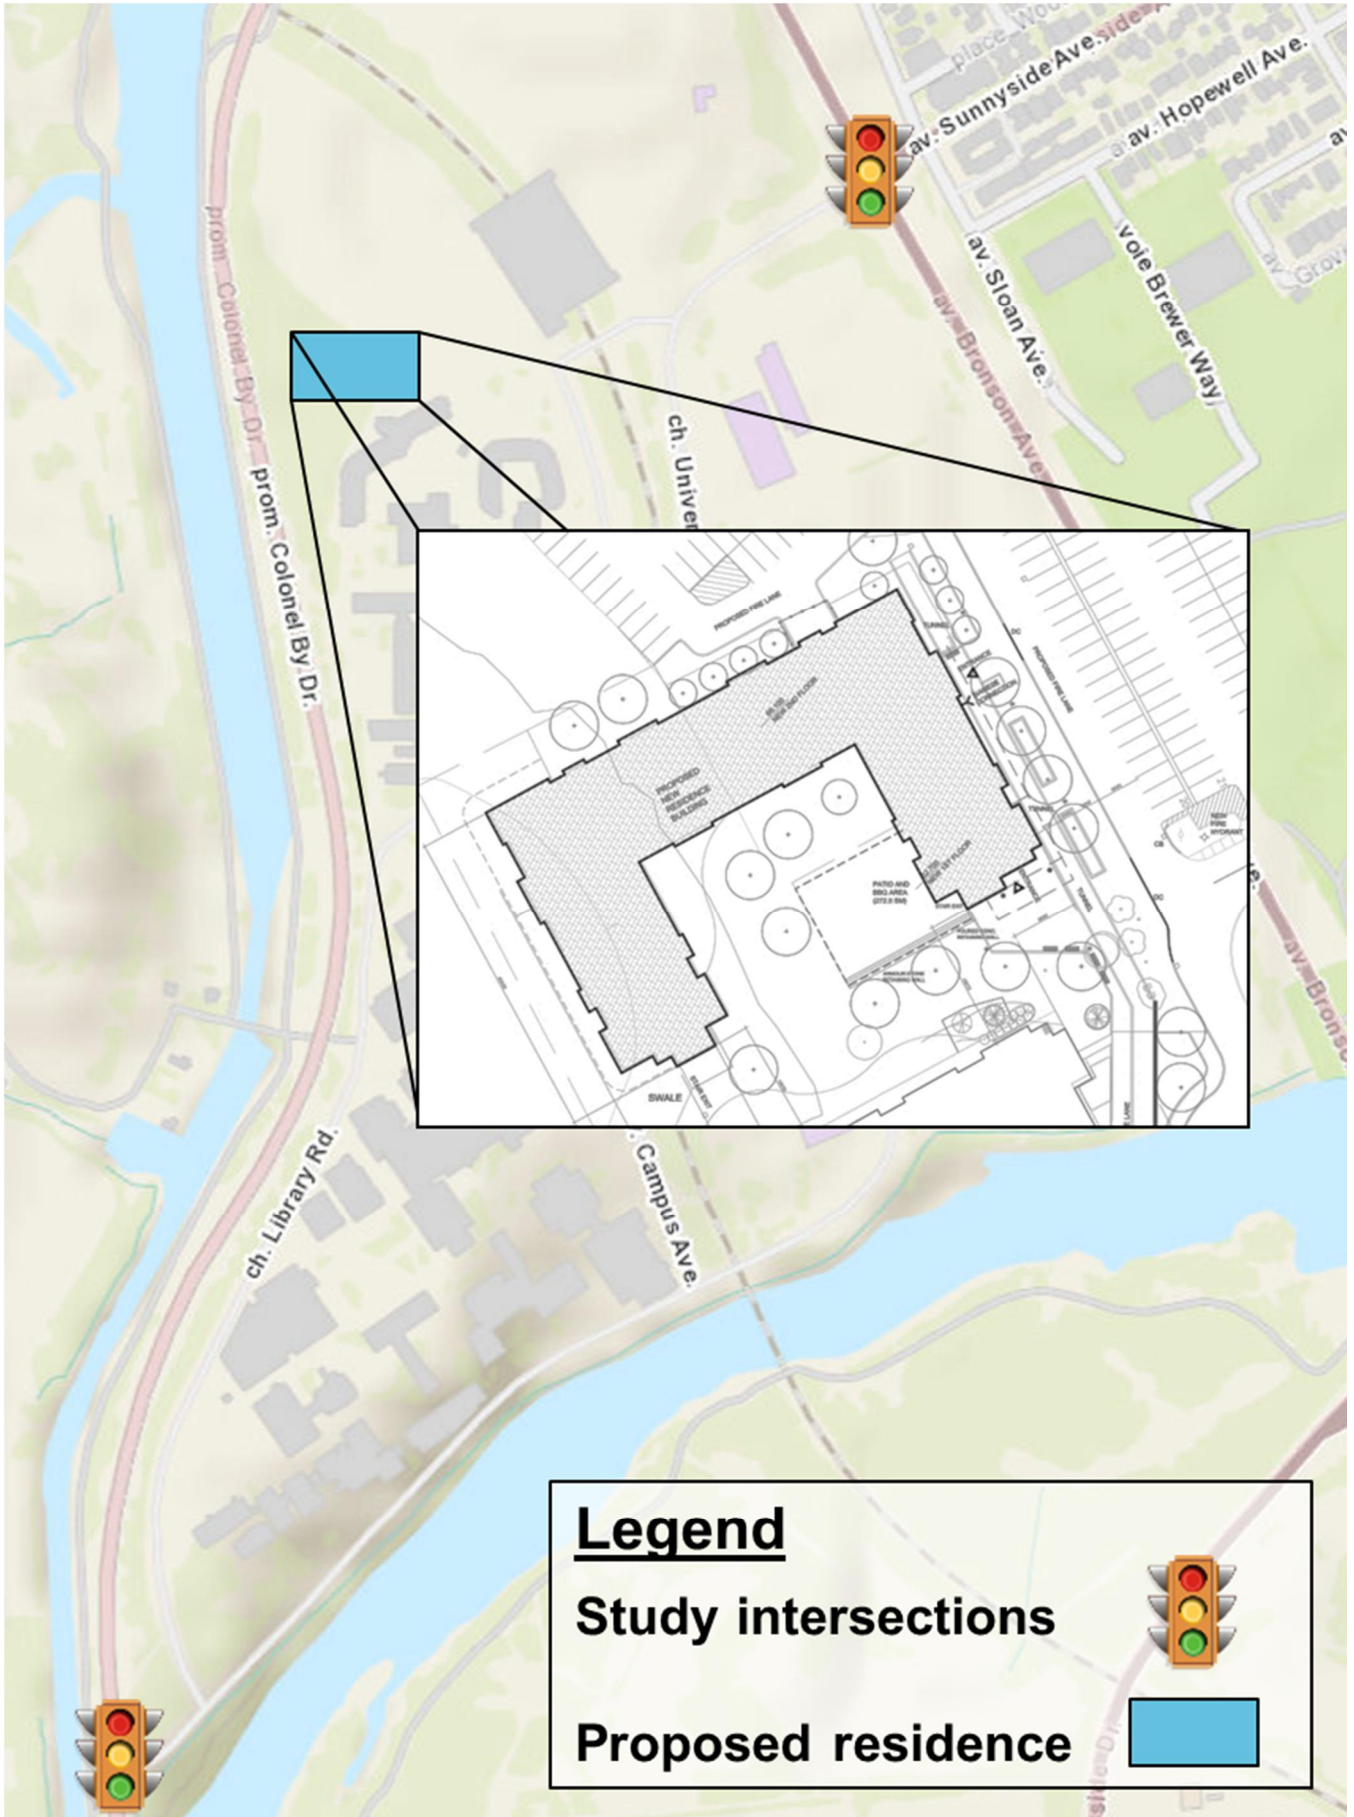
Key Area and Proposed Site Plan (Source: GeoOttawa)
